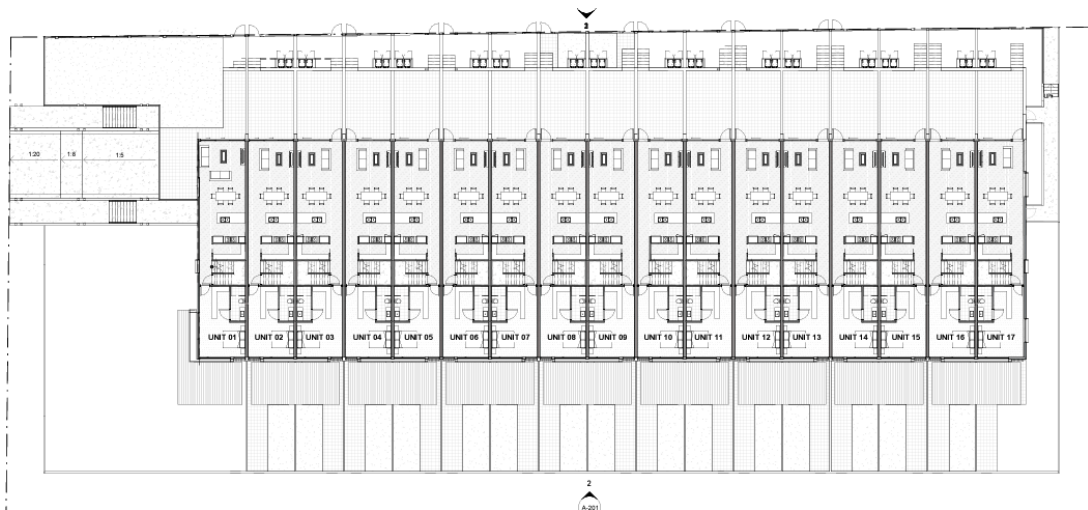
Floor Plan (Excerpt) - 1st Floor / Street level
